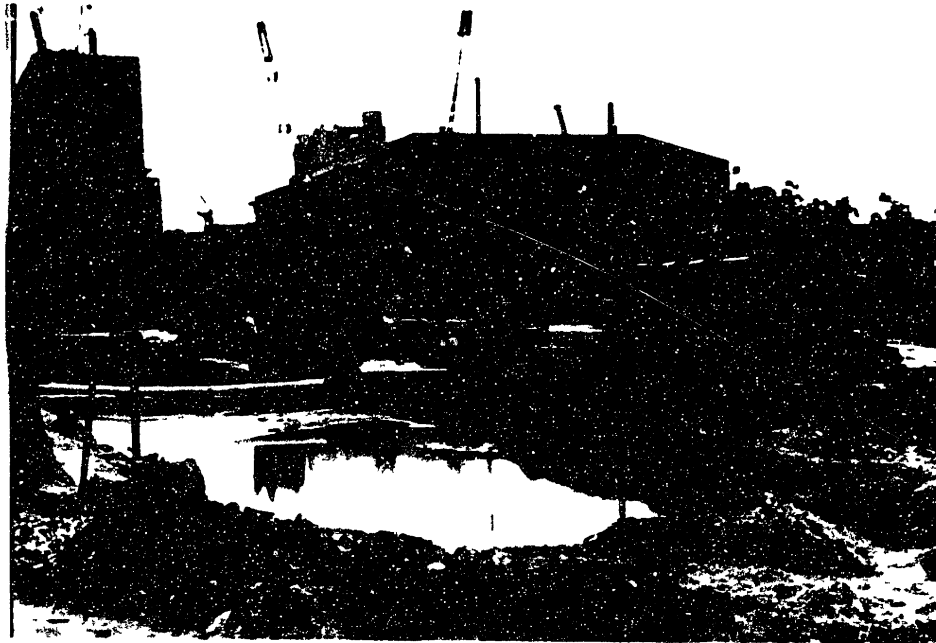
SLURRY SEDIMENTATION PITS USED FOR RECYCLING SLURRY
